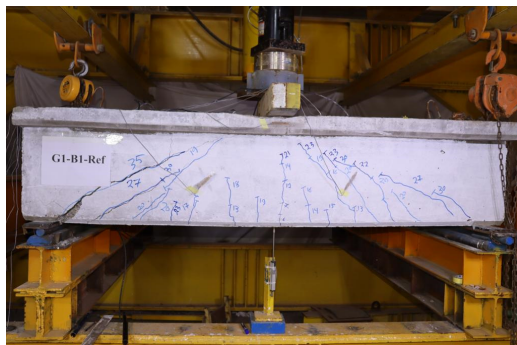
Failure crack pattern of specimen G1-B1-REF.
